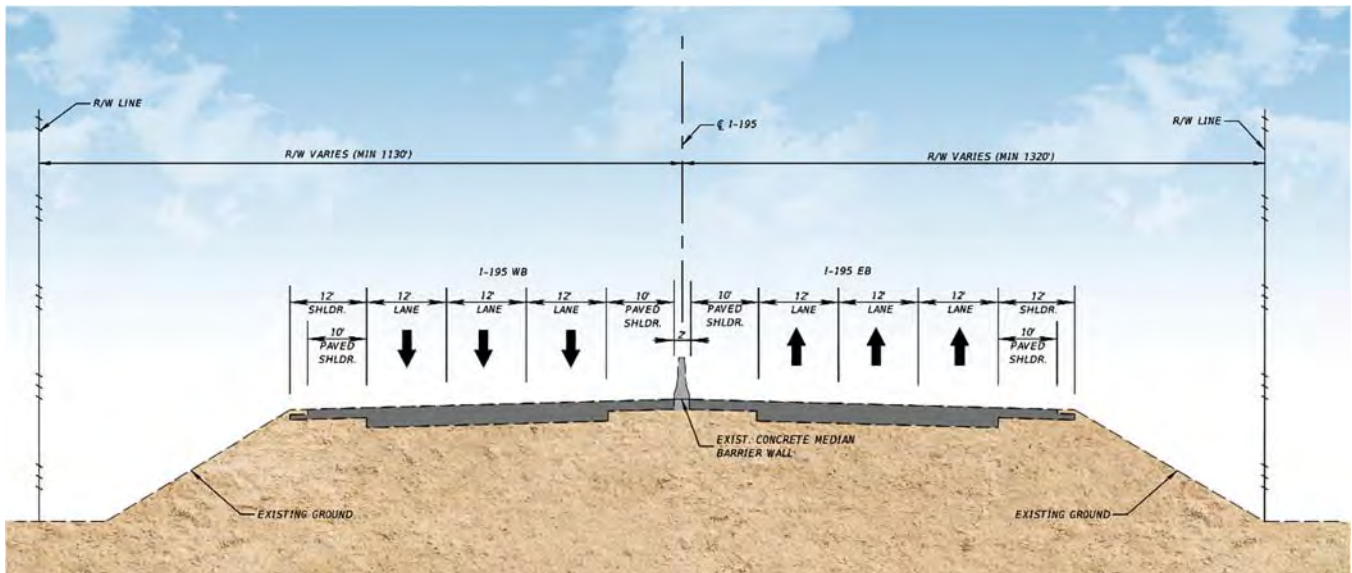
Typical Section - I-195 from NW 3rd Avenue to Biscayne Boulevard
